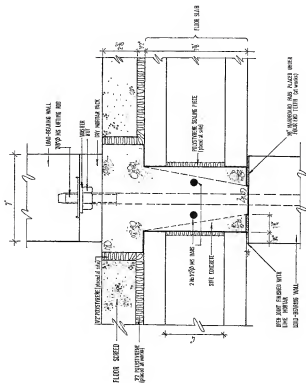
Figure F Joint H.4. Horizontal joint between floor slabs and cross wall
